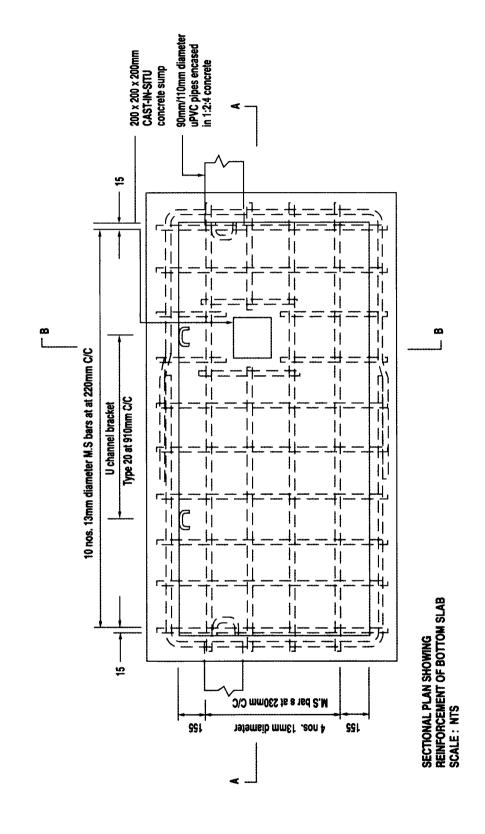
MANHOLE DRAWINGS - TYPE MX2
